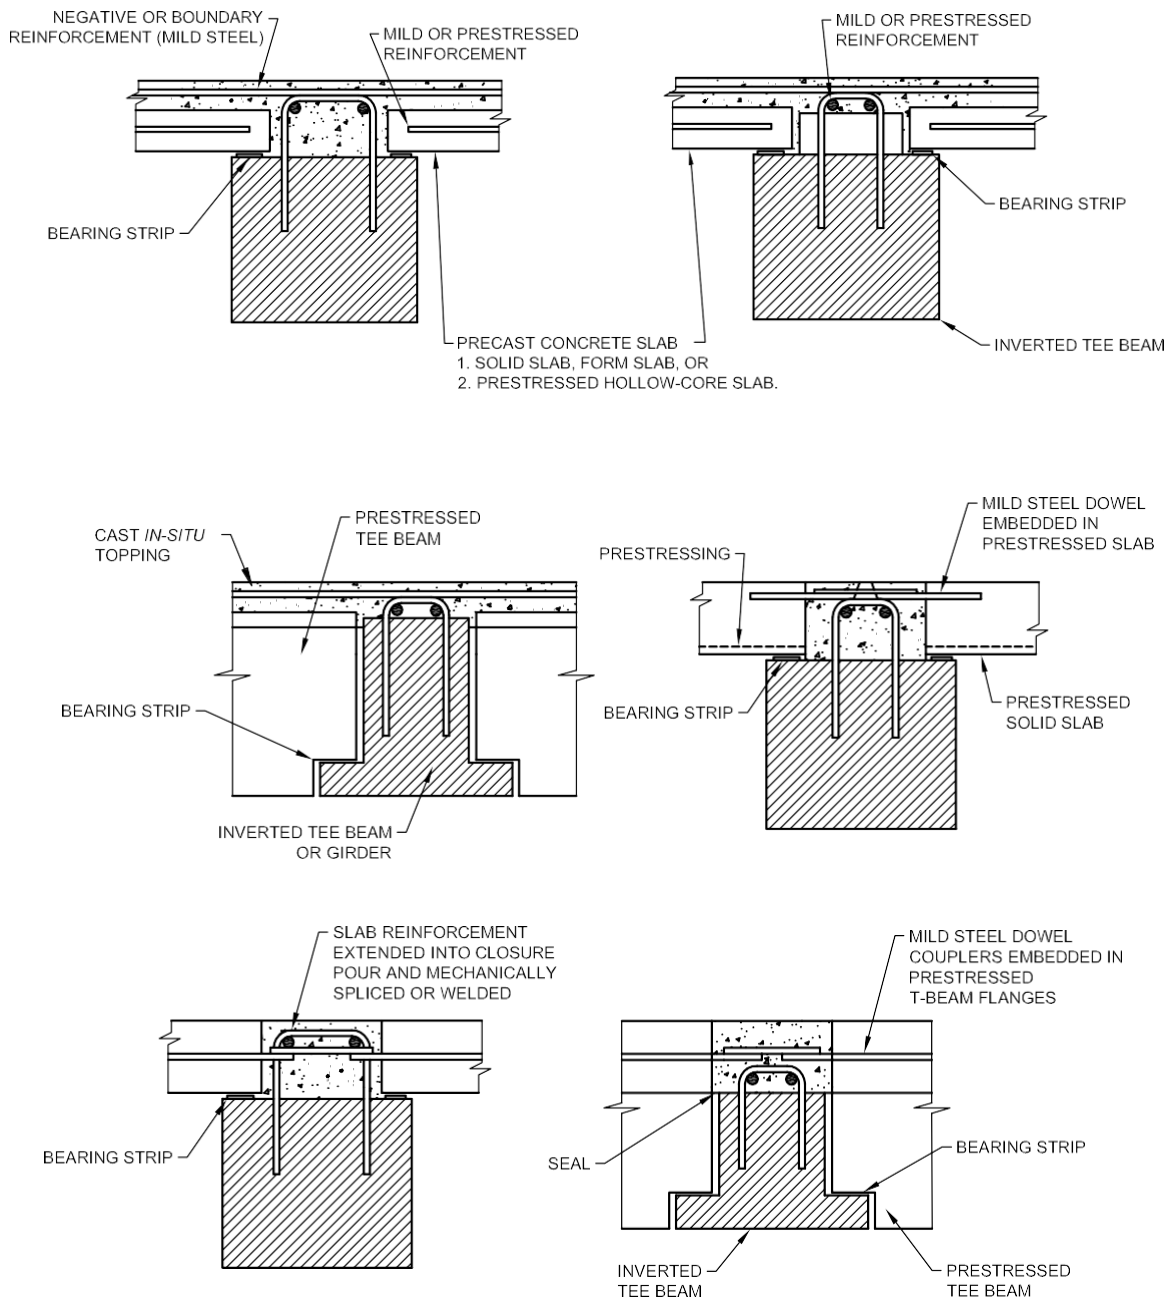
TYPICAL CONNECTIONS OF PRECAST FLOOR SLAB ELEMENTS
